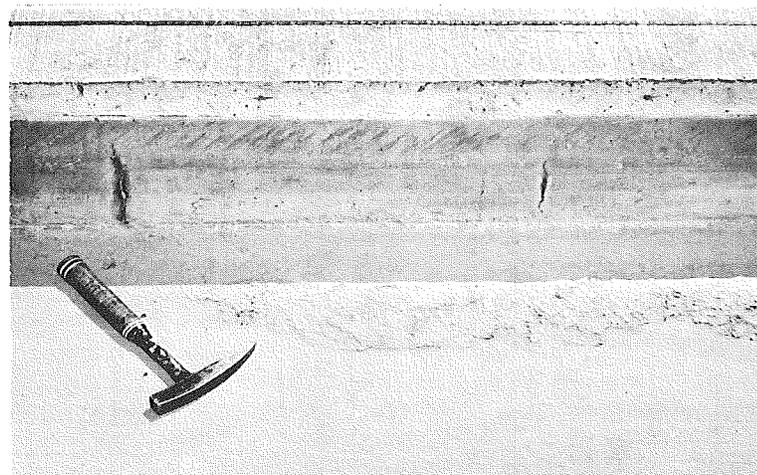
Weathering damage on John R. Ave Bridge over I 75 (May, 1967).
